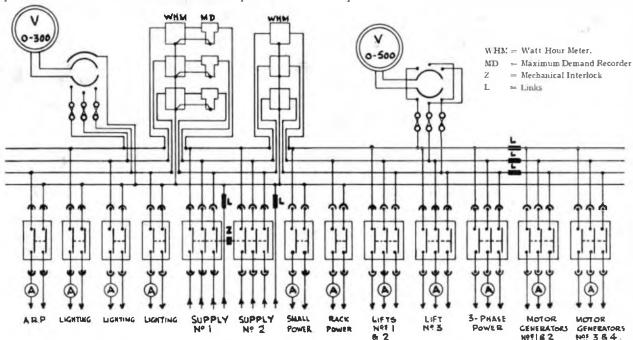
Low Tension Switchboard, Langham Telephone Exchange.
